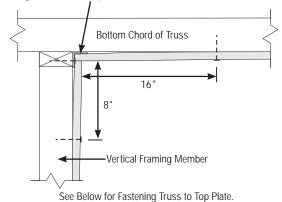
Floating Gypsum Corner (Truss Perpendicular to Wall)
